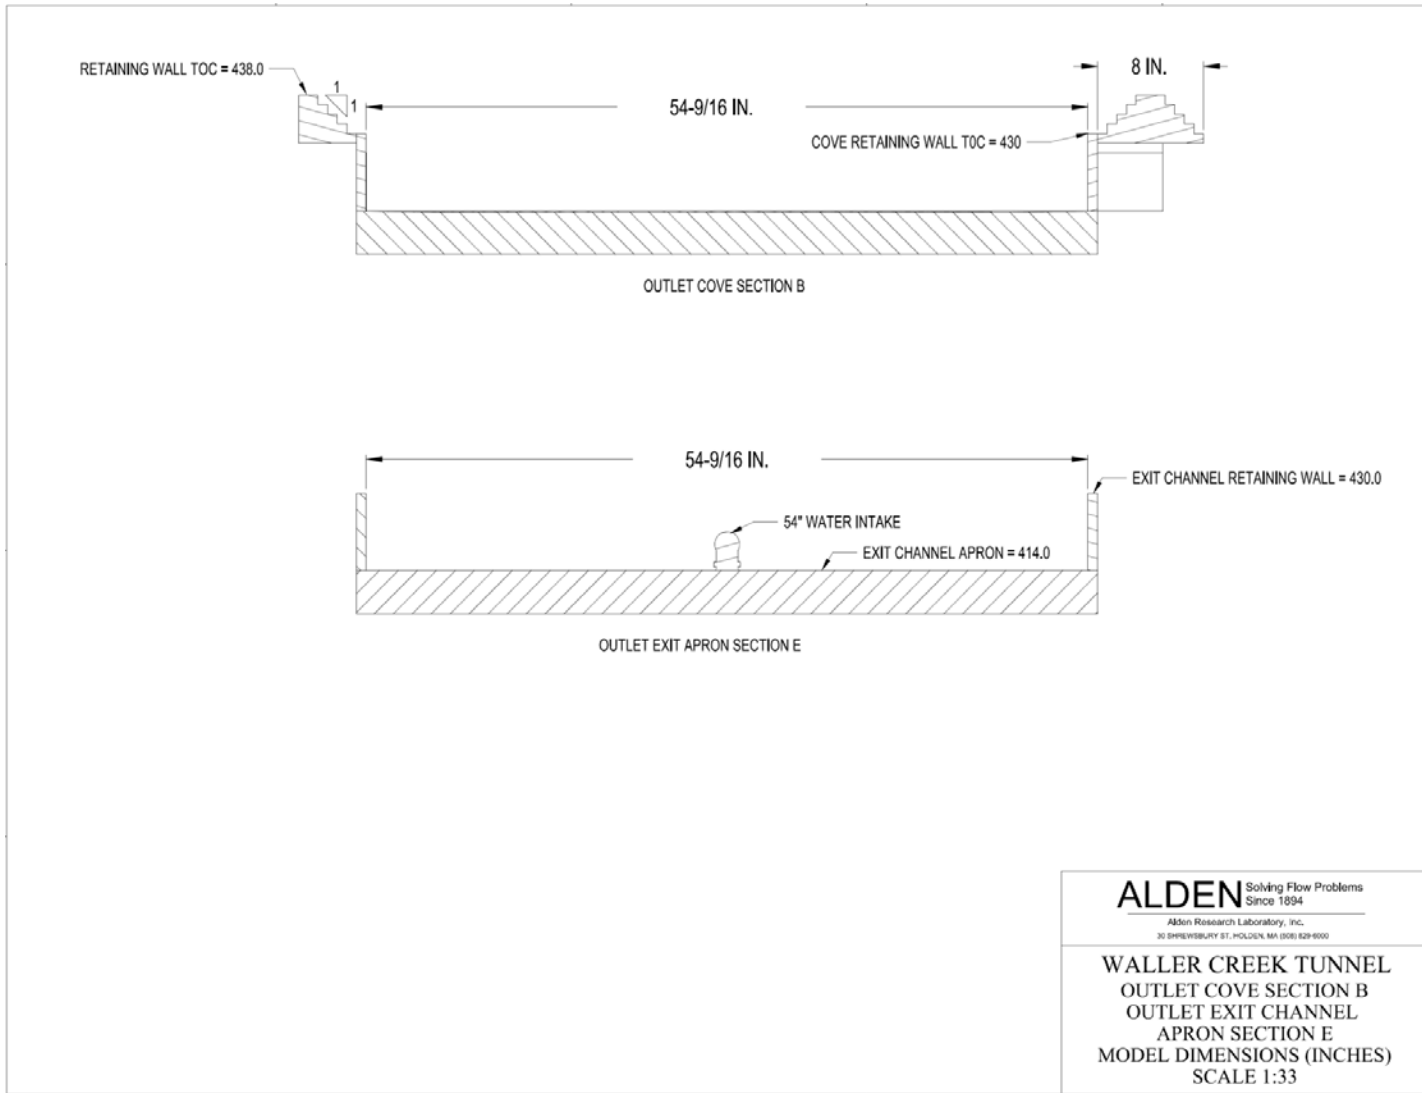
Waller Creek Tunnel Project; 1:33 Scale Model Outlet Dimensions –Sections B and E
